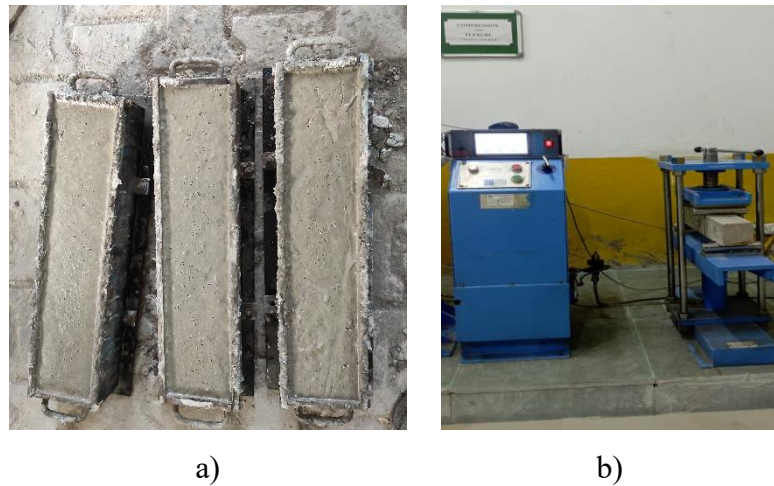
a) Beam specimen casted for flexural test b) Flexural testing of specimens
